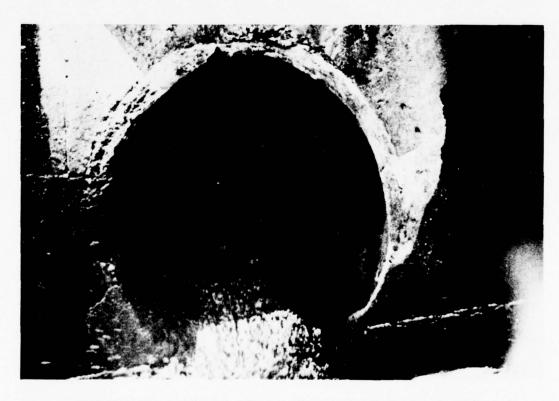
View of Outlet of 36 Inch Diameter North Control Conduit
